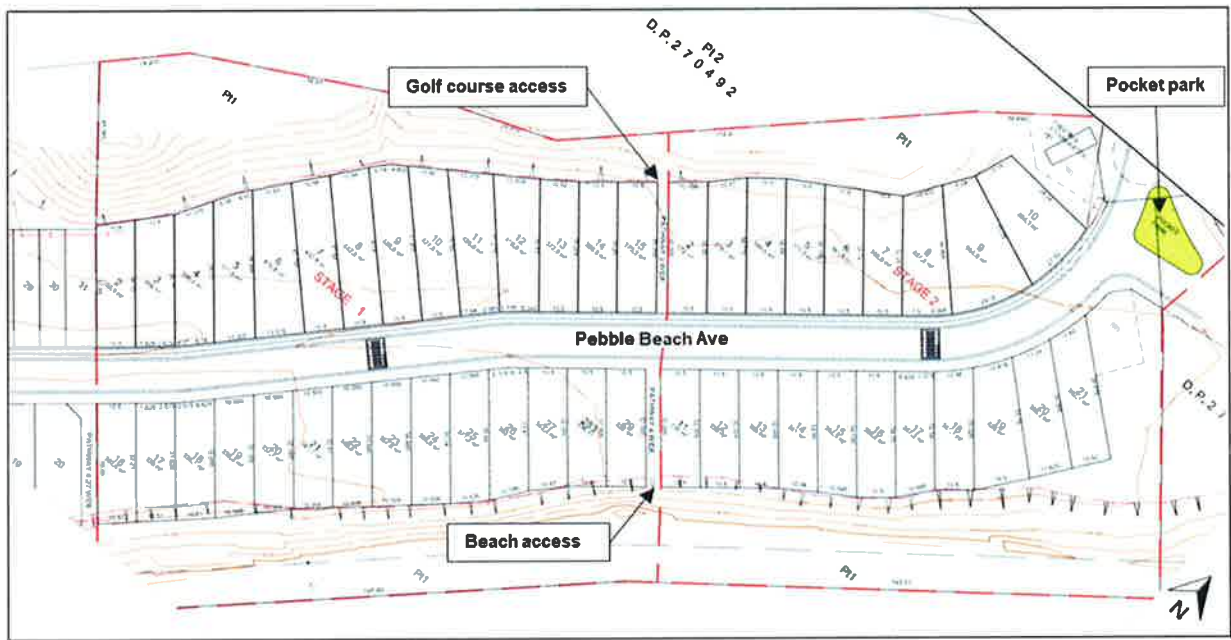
| The proposed Stage R07 subdivision layout (as amended) (Base source: Proponent's RtS)
